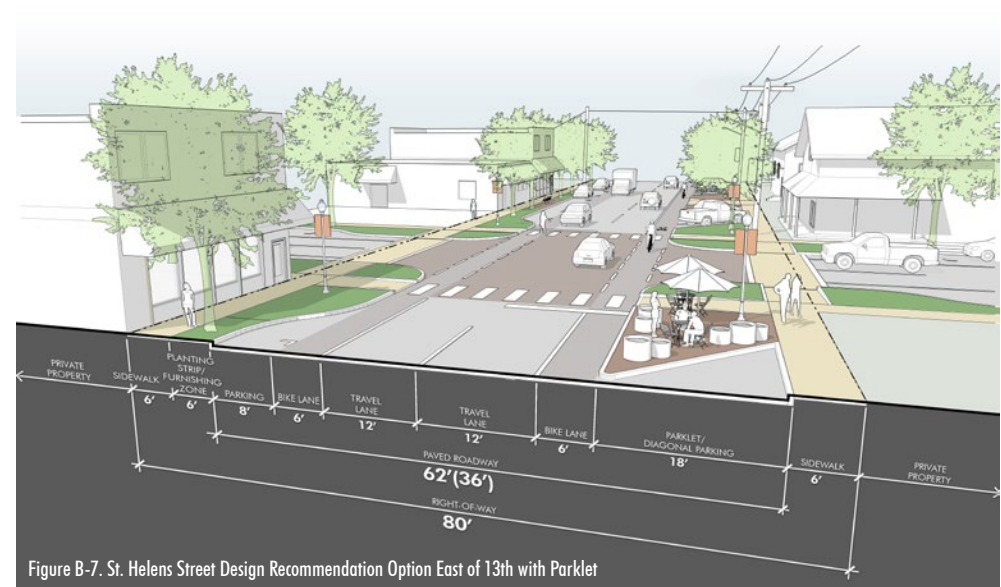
St. Helens Street Design Recommendation Option East of 13th with Parklet
